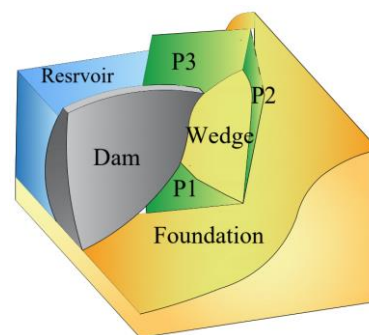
Dam-reservoir-foundation, wedge, and its supporting planes.
